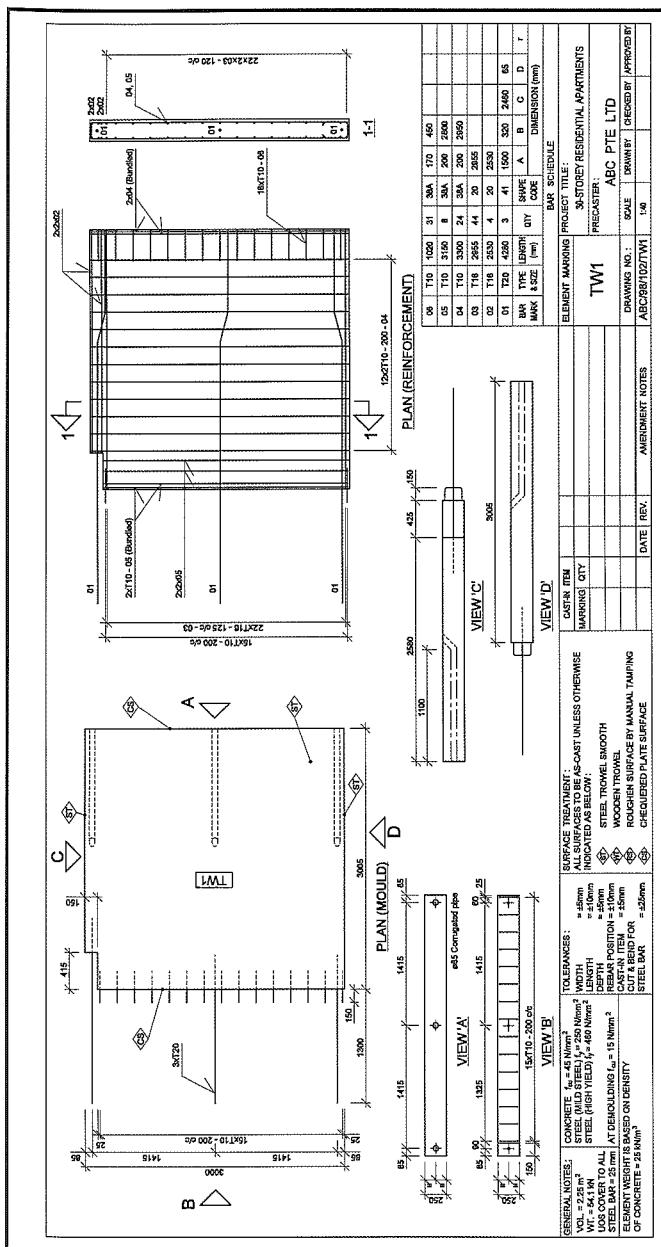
Mould And Reinforcement Details Of Precast Wall (Residential Block)
